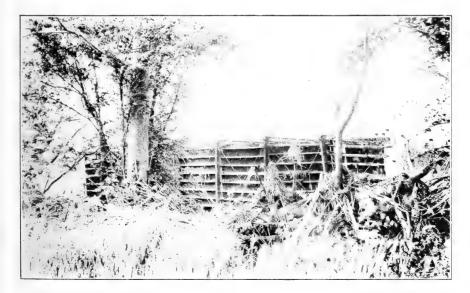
A thirty-foot bridge that was carried a half mile down scream from the public road north of Brownstown.
